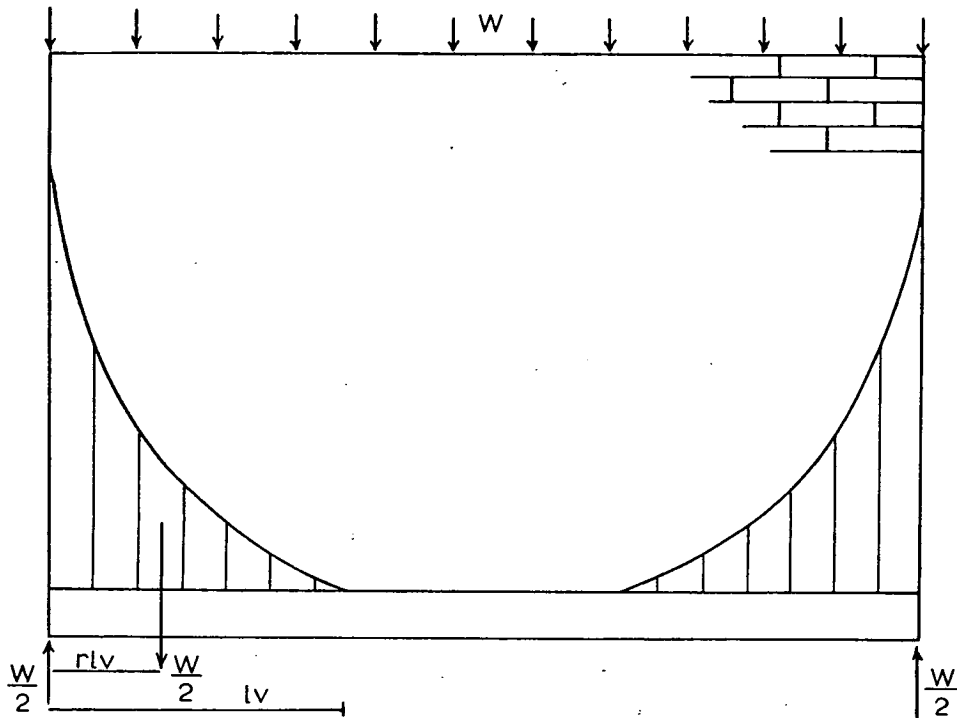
VERTICAL LOADING ON SUPPORTING BEAM.
